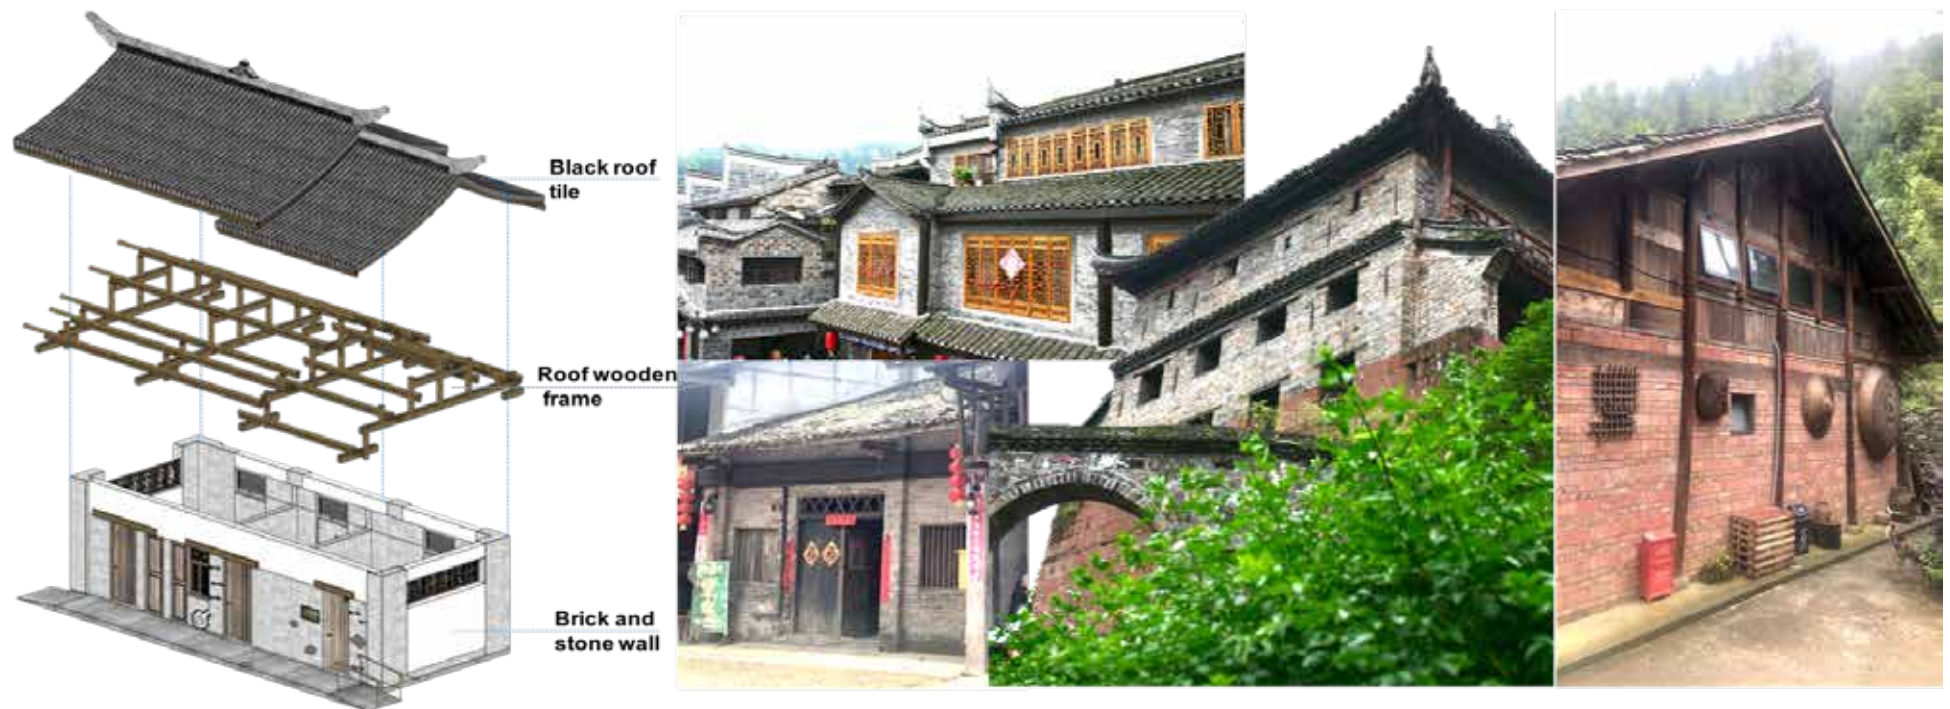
Brick and wood structure (source:photo and drawing by author)
